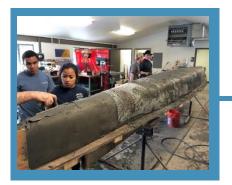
Apply Reinforcement Figure 20: Trowel Final Layer of Concrete
